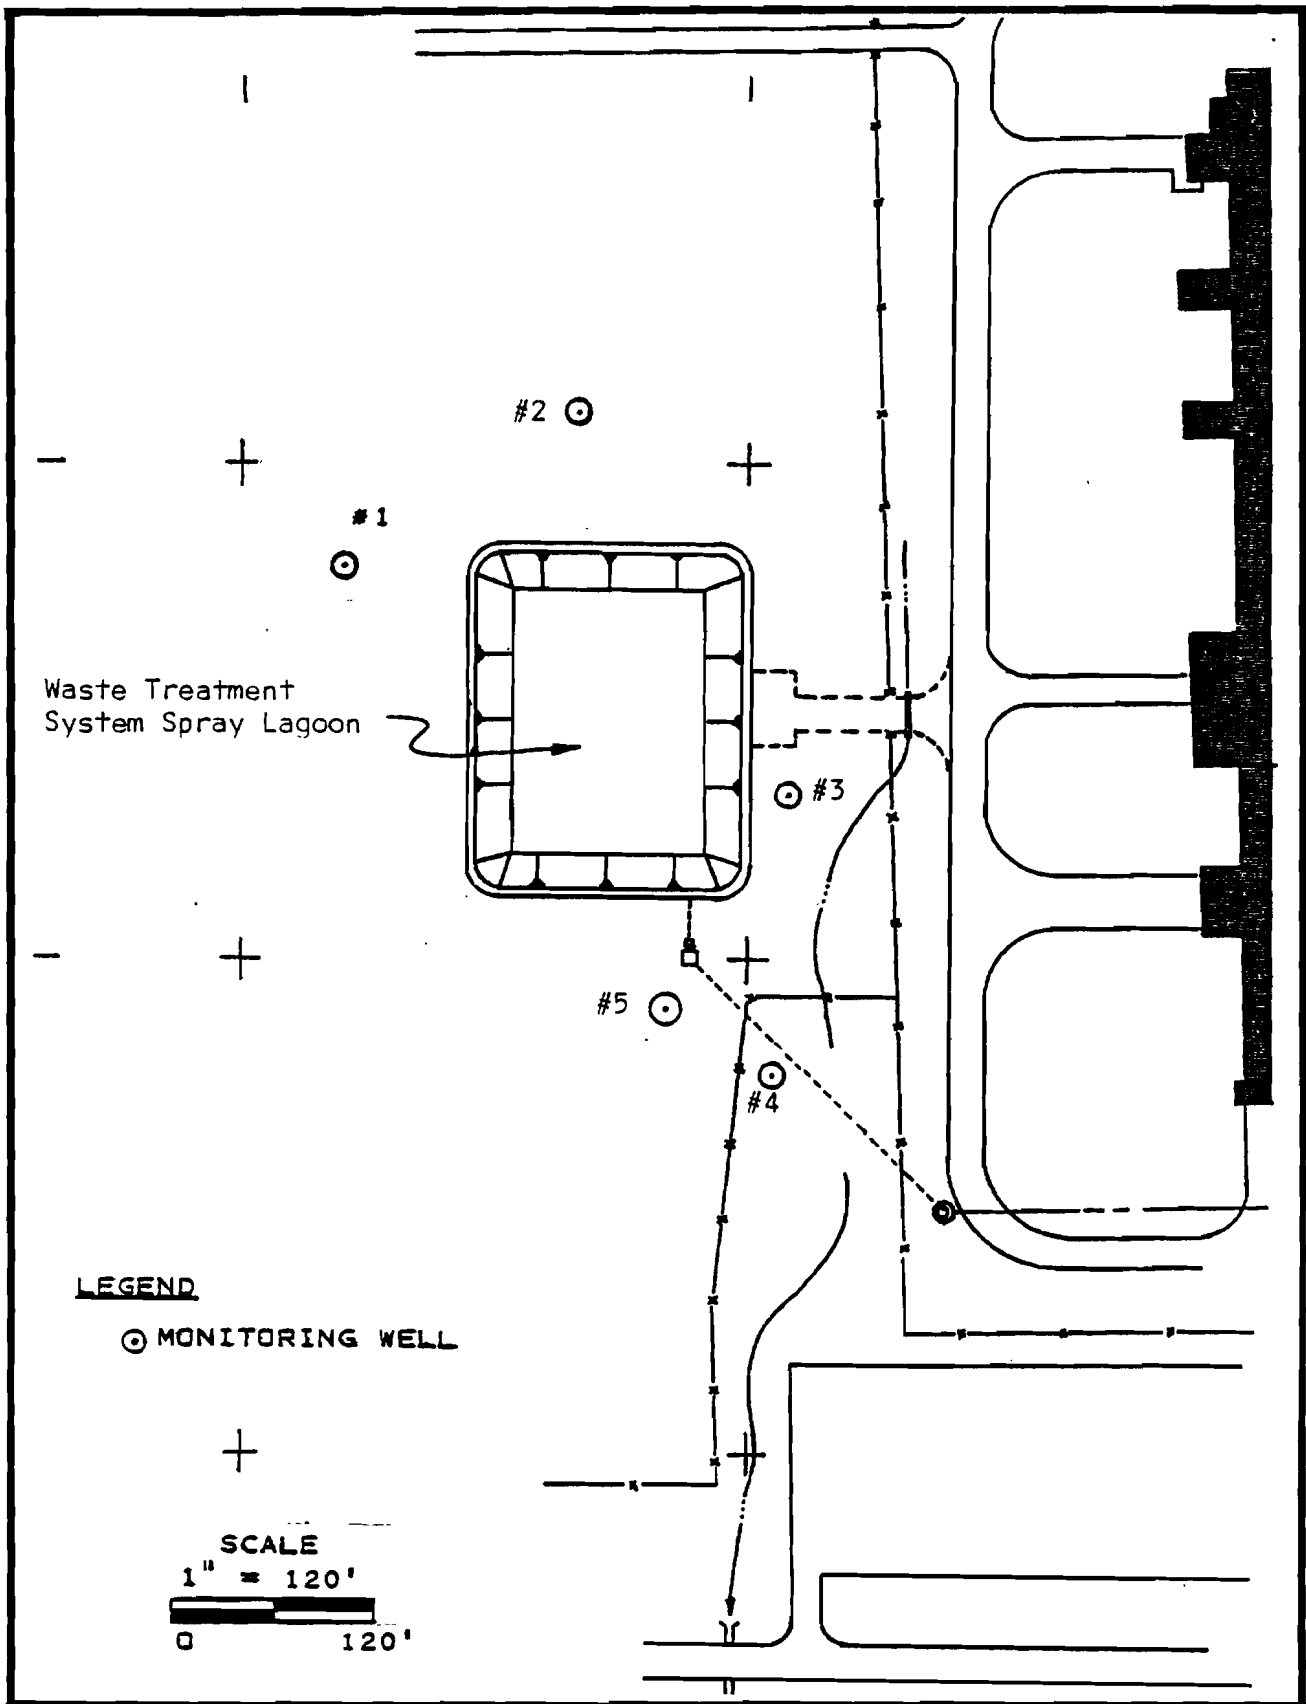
Site Z₃, Spray Lagoon, Exploration Location Plan.
